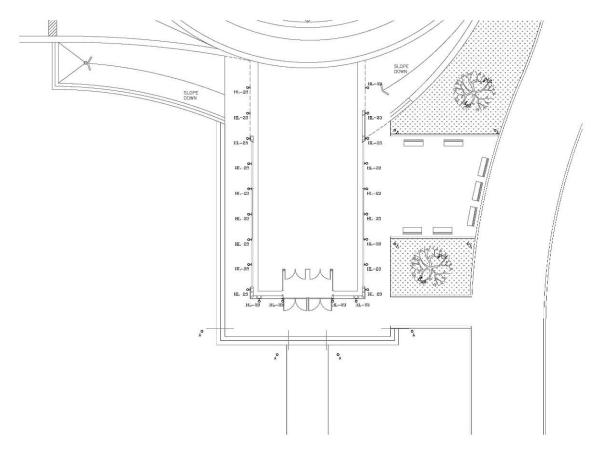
Reflected ceiling Plan (reference Appendix for luminaire types)
